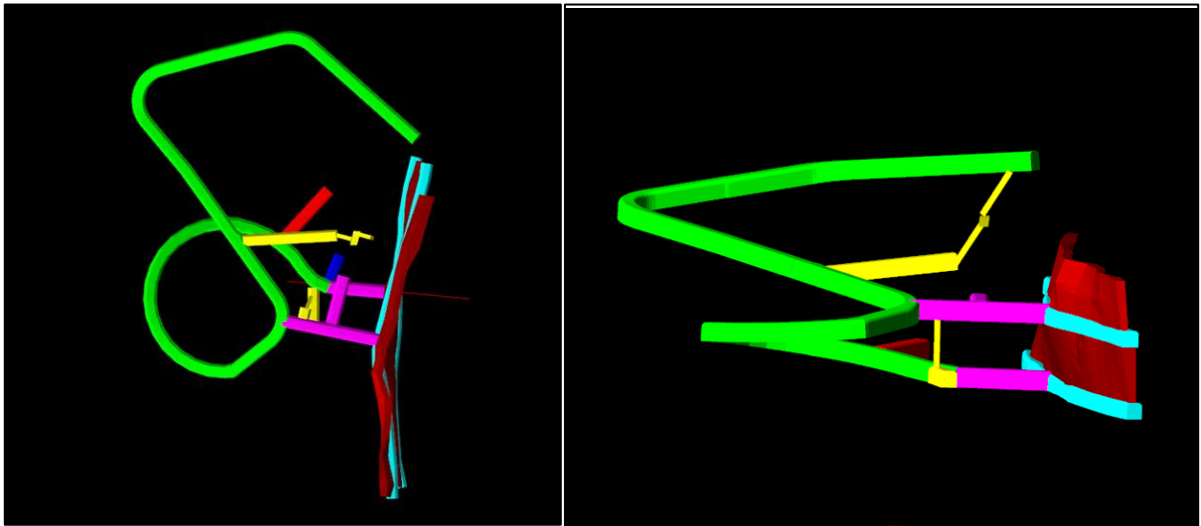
Left: Plan View with North to top Right: Cross-Section looking North
